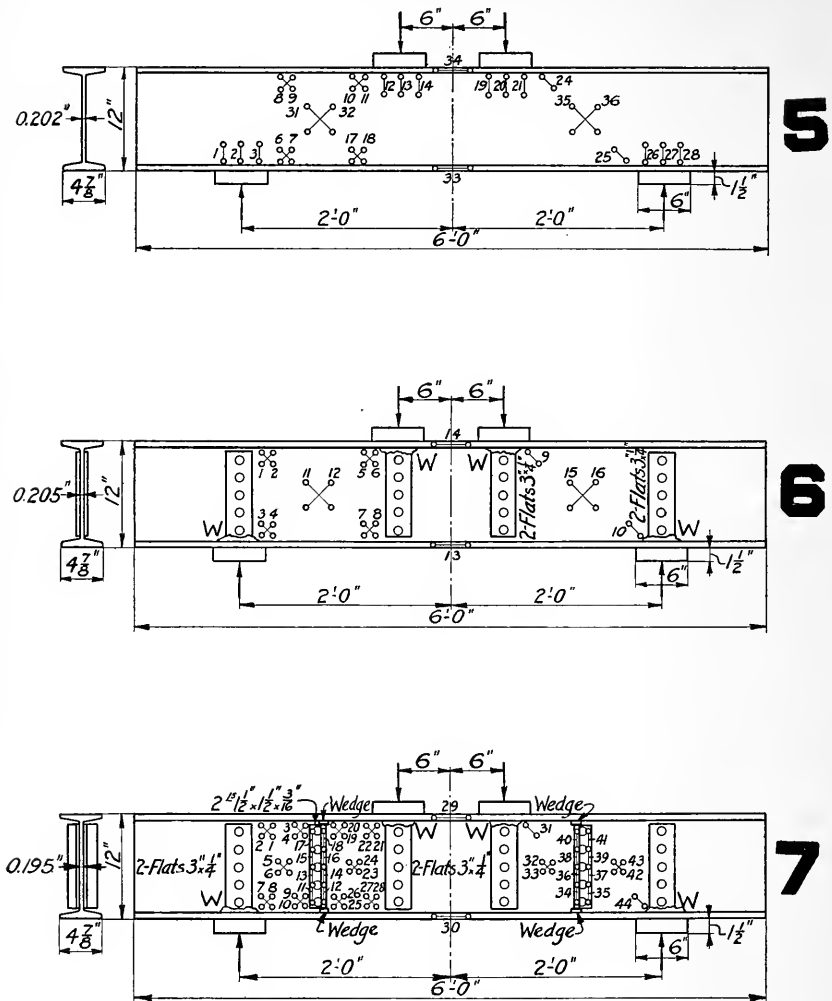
I-BEAMS 5, 6, AND 7 SHOWING LOCATION OF GAGE LINES (W DENOTES AN OXY-ACETYLENE WELD)
